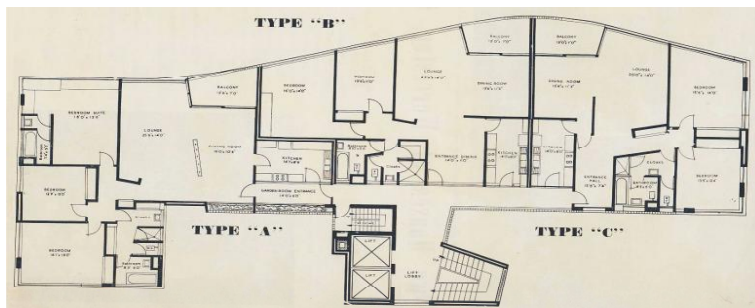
Plan illustrating the curved front elevation (Source- Benjamin & Crofton: 1958, 41)
